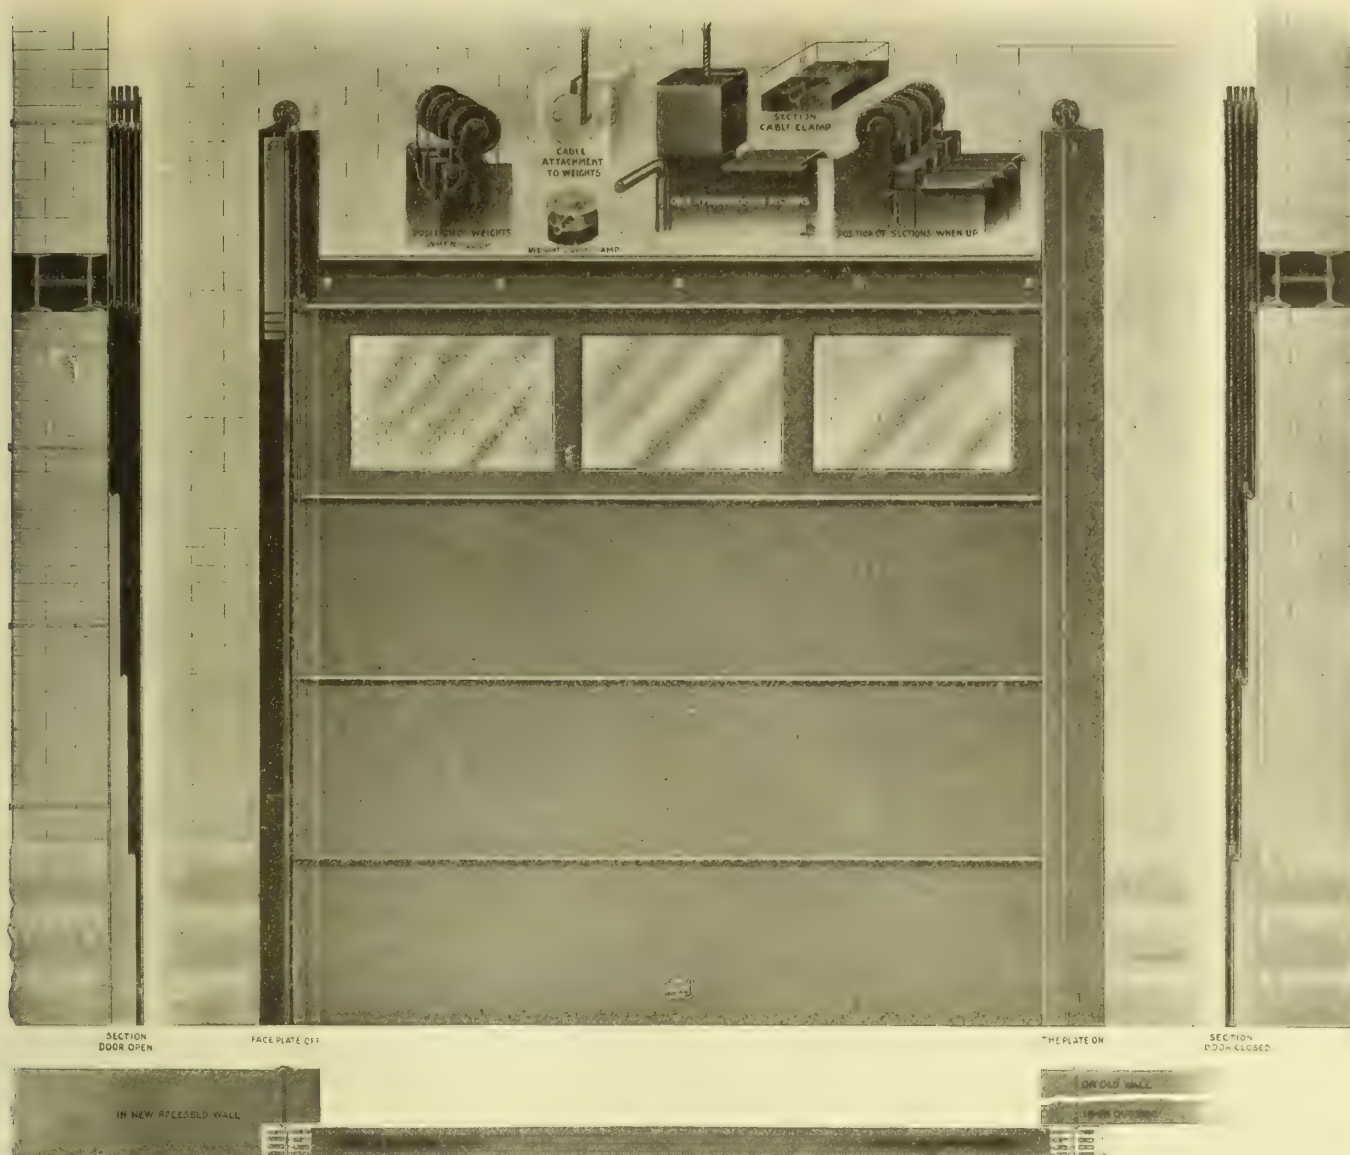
DETAILS MESKER SECTIONAL STEEL DOORS
